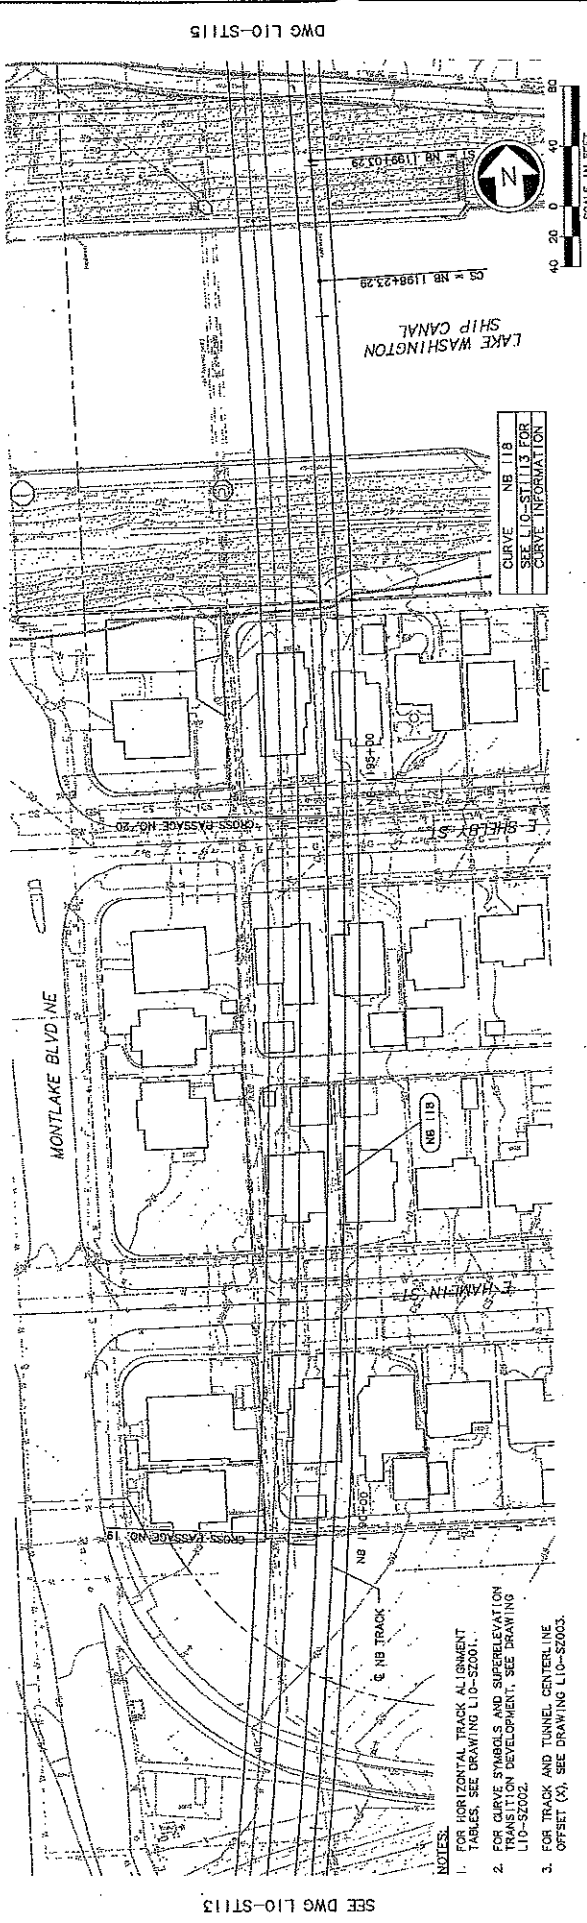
ST115 Vault Plan No: 24 Sheet No: 0		LINK CONTRACT U220 TBM TUNNELS (OWS TO CHS)		TUNNEL STRUCTURE PLAN & PROFILE STA NB 1195+00 TO STA NB 1202+06.40
